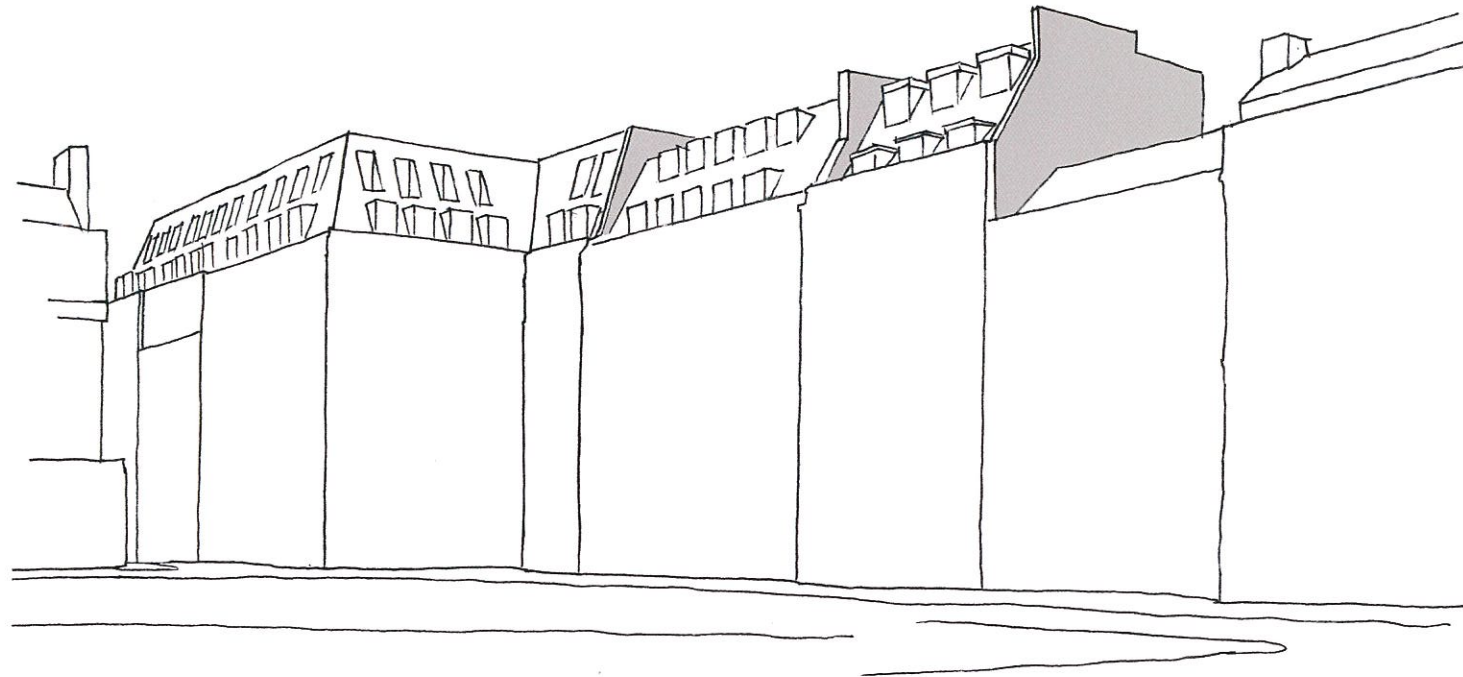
| View of Soho Square illustrating the party walls acting as separating elements
